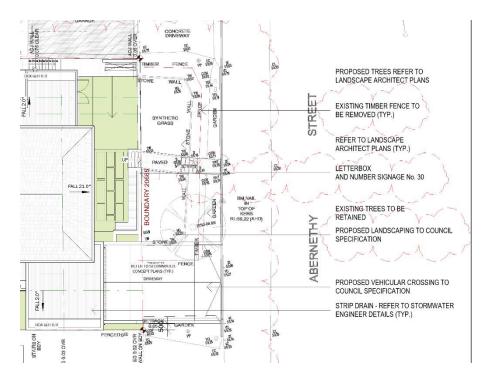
Site Plan showing Removal of existing Timber Fence and relocation of letterbox
